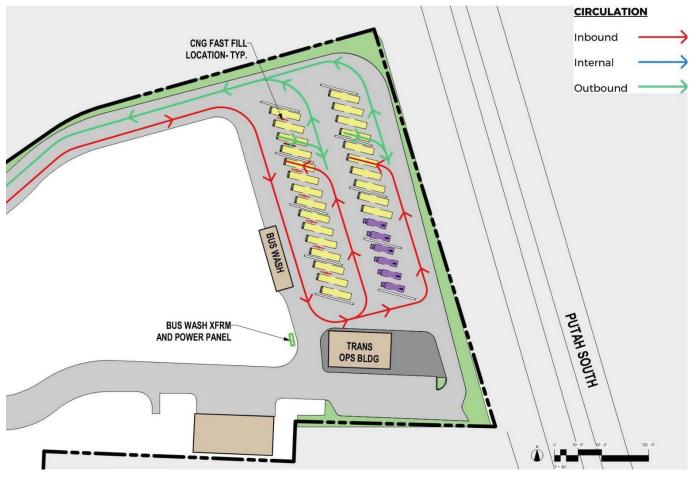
Vacaville City Coach Existing Facility and Site Circulation
